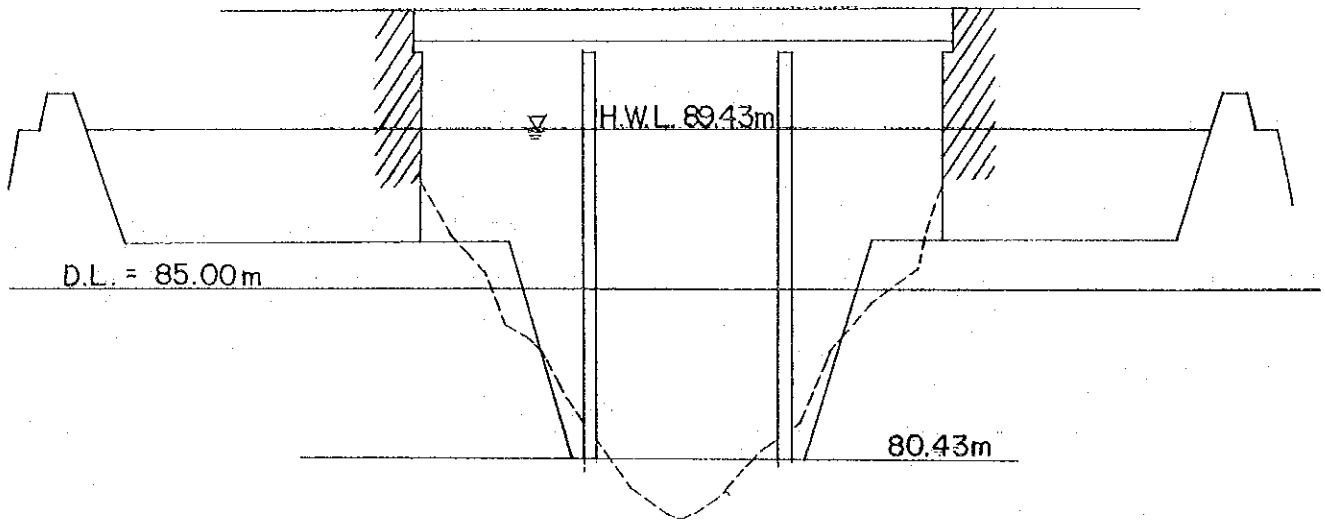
Proposed Standard Cross Section in Bengawan Sala
